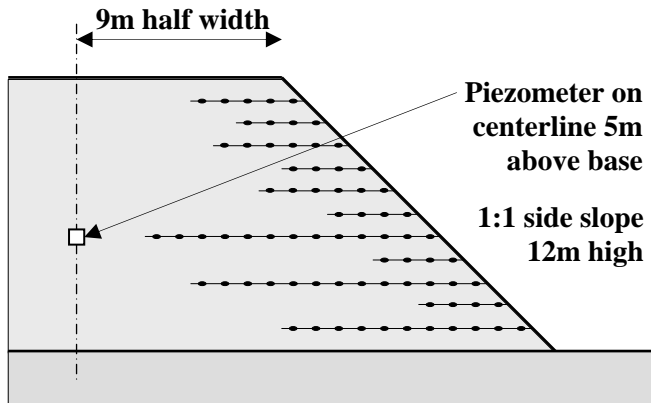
Section through Canadian trial embankment after Liu et al (1994)
